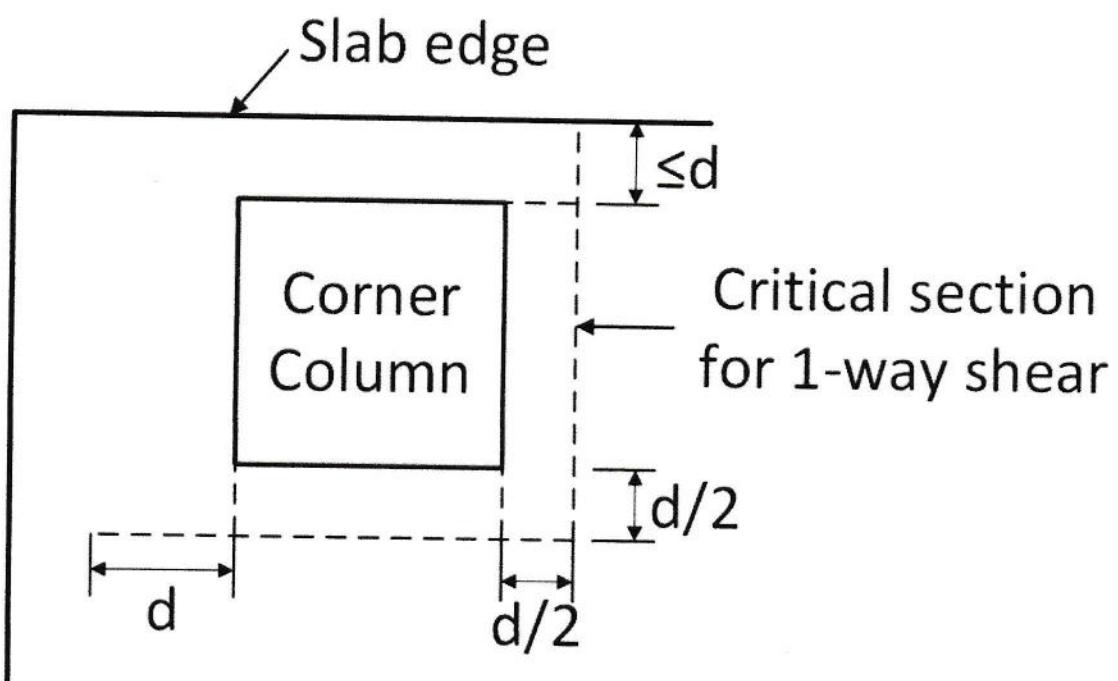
Critical Section for One-Way Shear at Corner Columns
